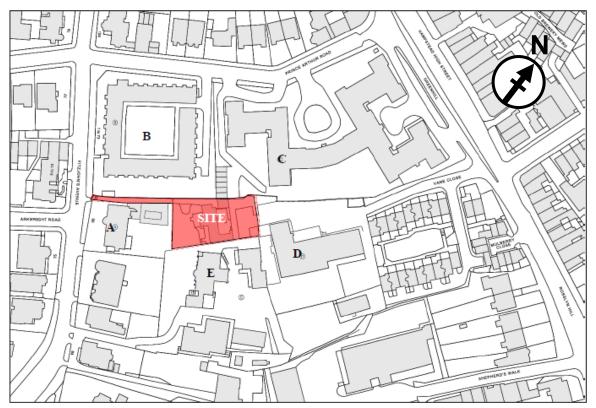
Location Plan: A- St Anthony's Preparatory School; B-Henderson Court; C-Greenhill (apartments); D-The Royal School Hampstead; E-Fitzjohn's Primary School
